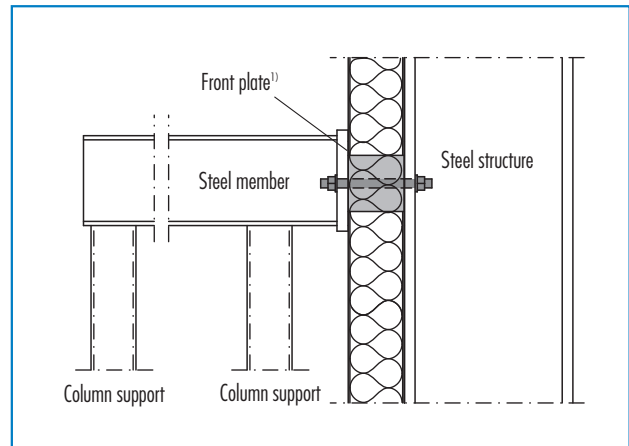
Schöck Isokorb® KST-ZST module for restrained steel structures
